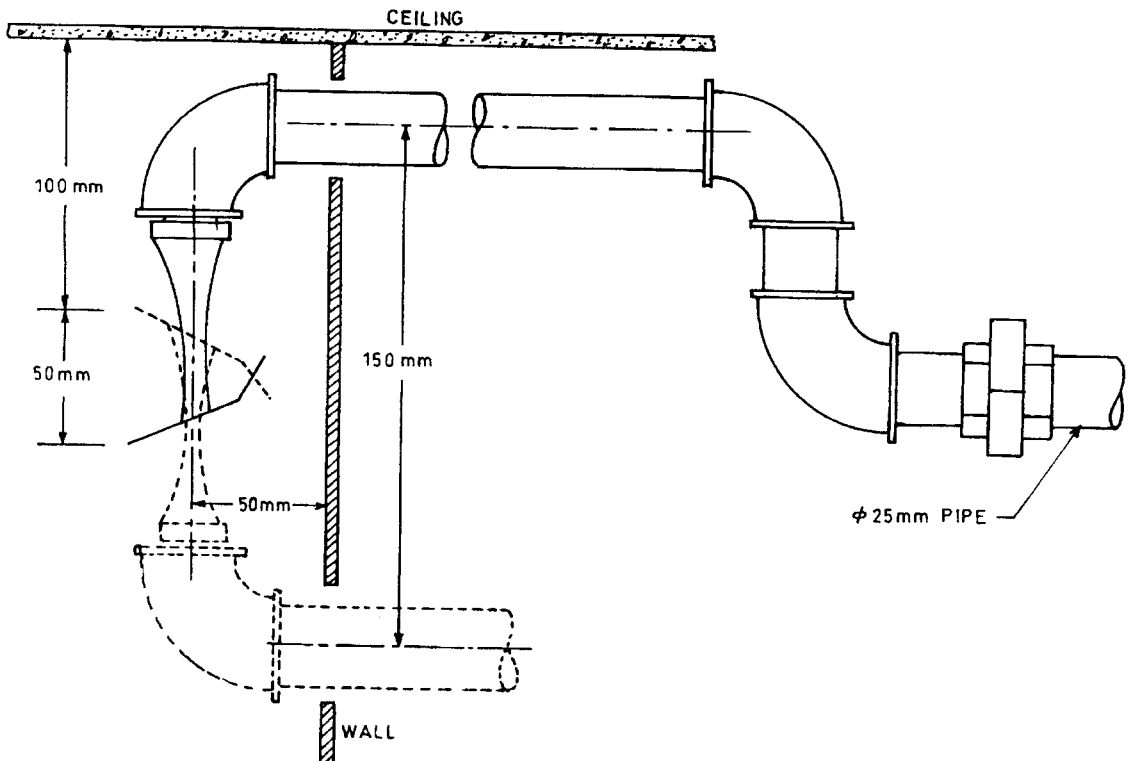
MOUNTING OF SIDEWALL SPRINKLERS — DISTRIBUTION
